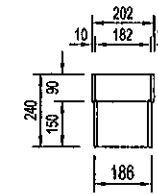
# DETAIL OF CONNECT PIPE/ CHI TIẾT ỚNG NỚ
